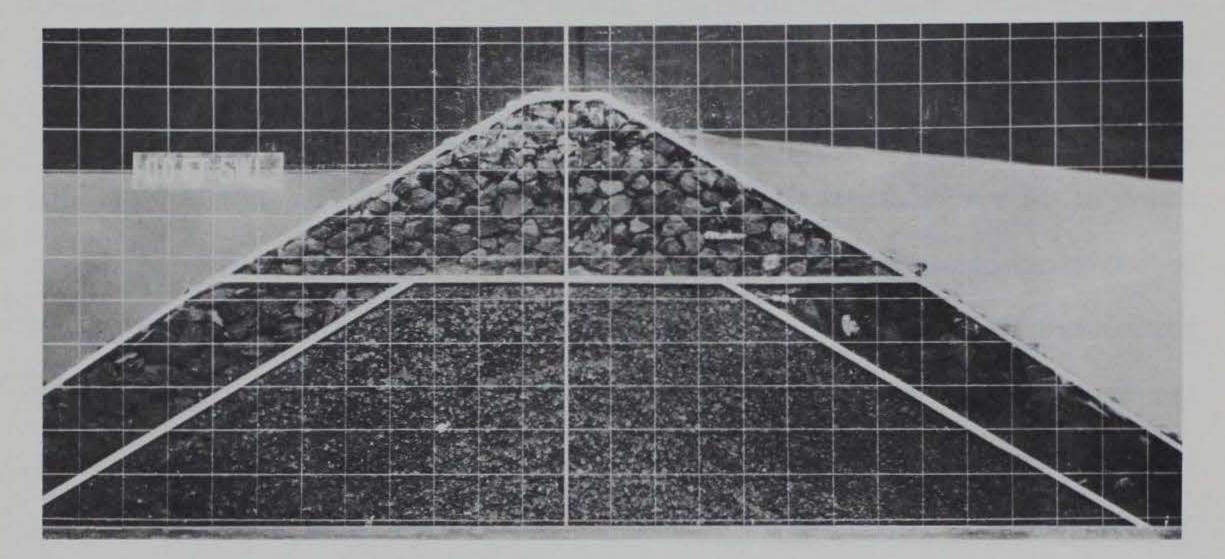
Investigation of Iribarren's formula, 10-sec waves 11 ft high attacking a rubble breakwater constructed of 4.6-ton, 2.8-specificgravity, basalt cap rock placed on 1 on 1-2/3 slope
